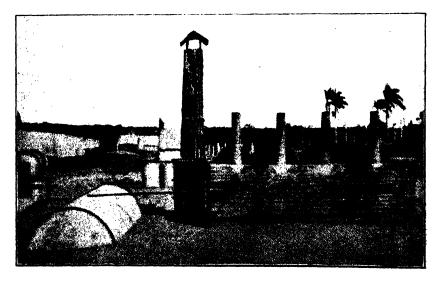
Rear view of furnace, showing smokestacks and pipes for transferring the boiler water from the drums to the tank.
